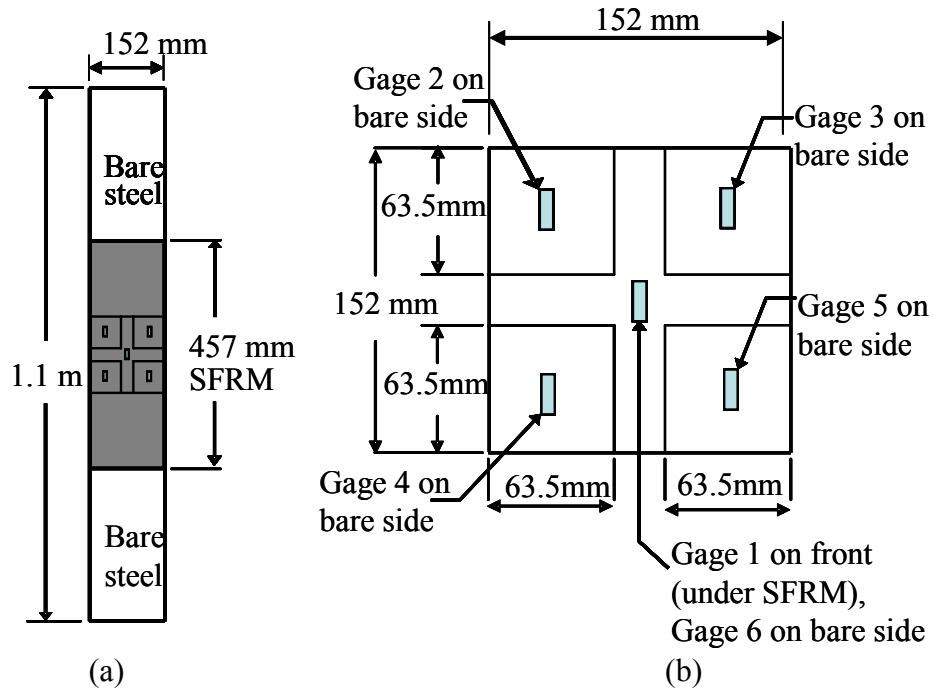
Test plate setup: (a) overall view of test plate; and (b) close-up of test area (note front face is the side of the plate with the SFRM)
